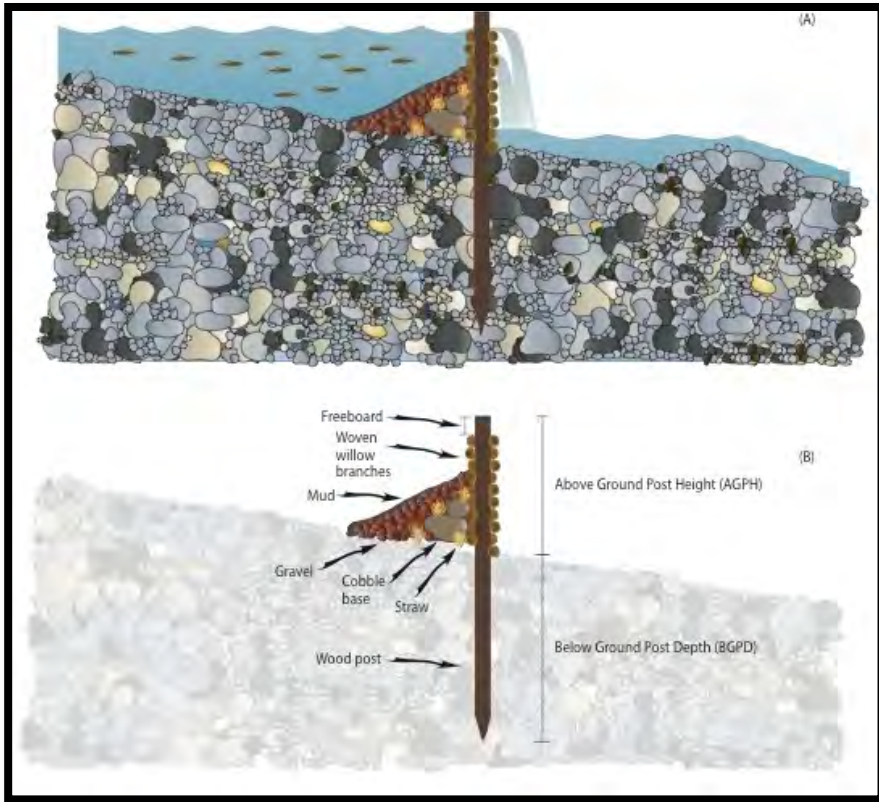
Diagram of a starter dam, showing design detail and the necessary material needed for construction. (top) side view (bottom) plan view.
